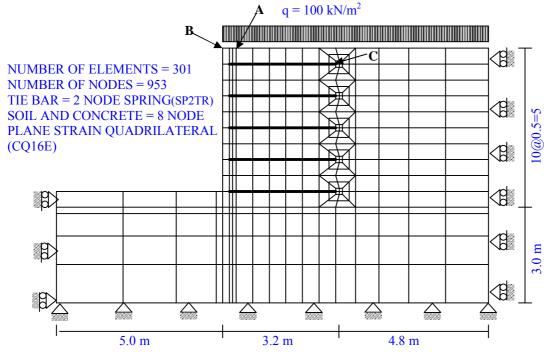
Finite element mesh and boundary condition of proposed anchored earth wall
